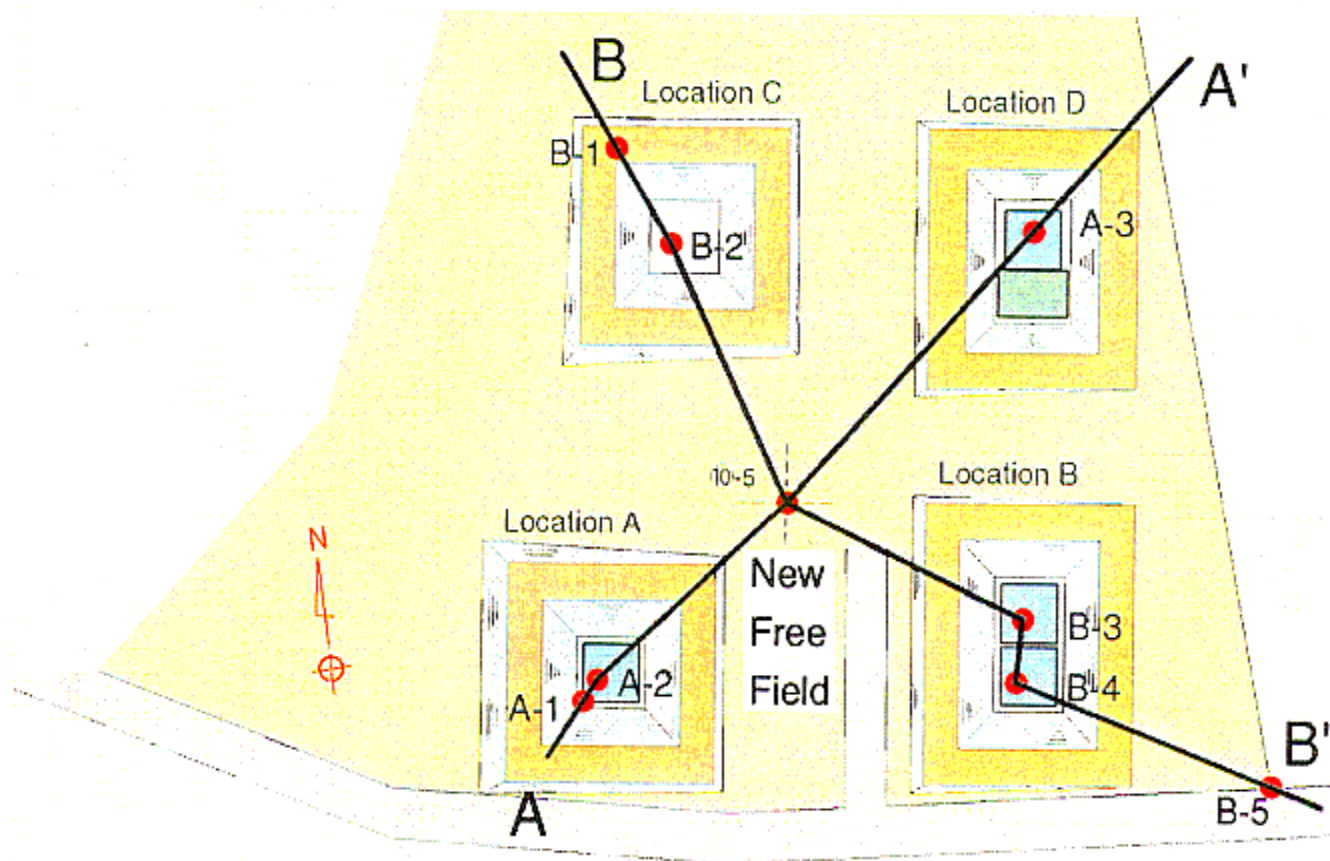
Location of Boring Points under Building Models and Cross Sections for Soil Profiles
